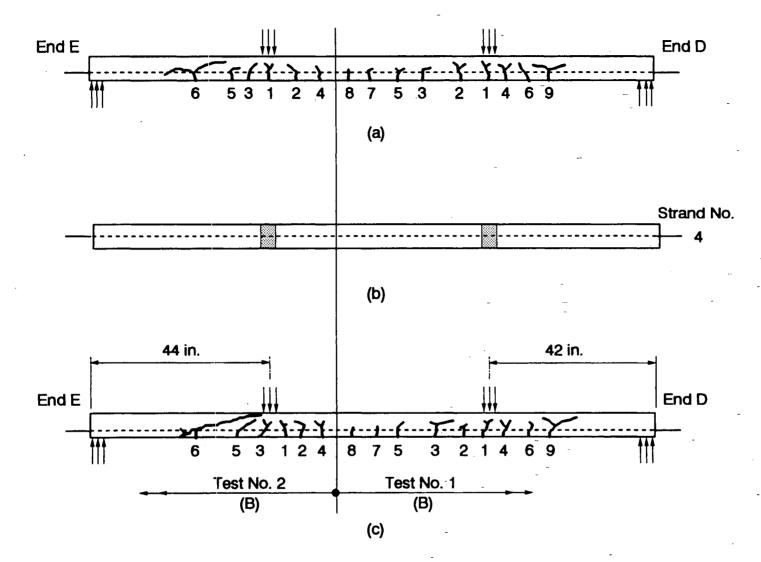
Crack patterns for D-type Specimen No. 11-6.0DU-12: (a) mirrored side view along Strand No. 4; (b) top view; (c) side view along Strand No. 4
